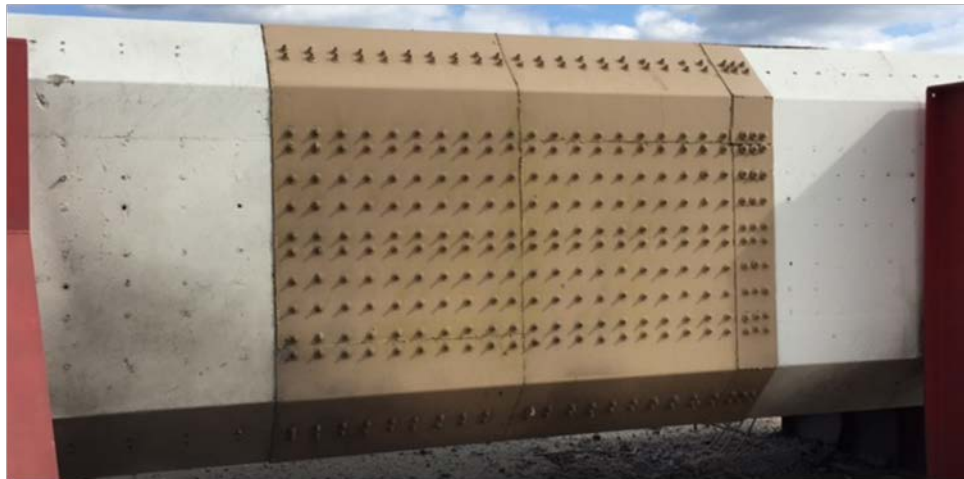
Post-Test Image of Hardened RC Tower Specimen Back Face
